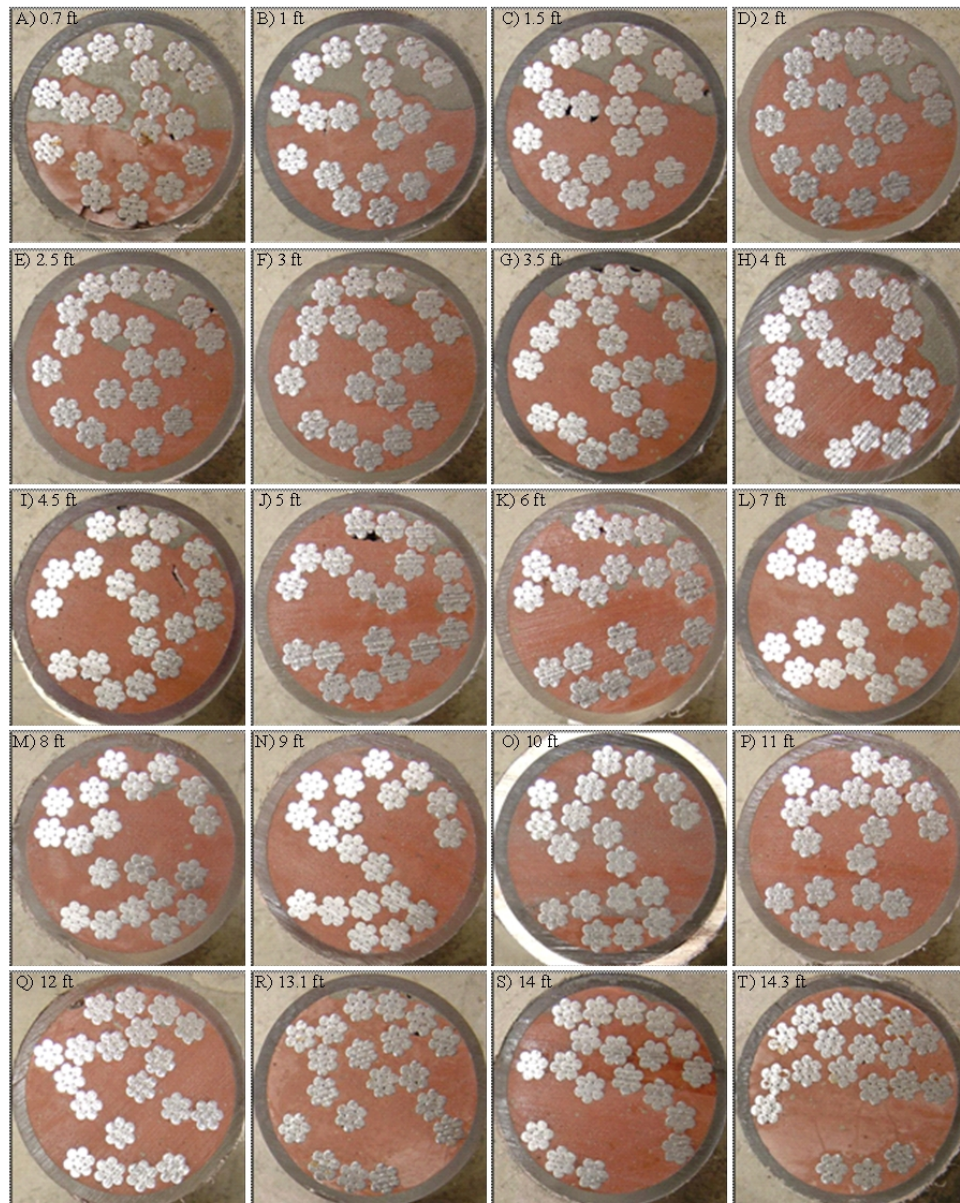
Cut Sections of Specimen PVG-C2-1 for the Filling Analysis of Repair Grout.
